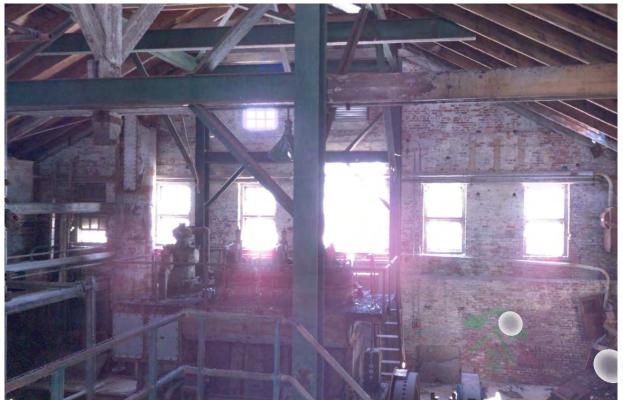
Building 2, Wall C, interior elevation from 3D view.
